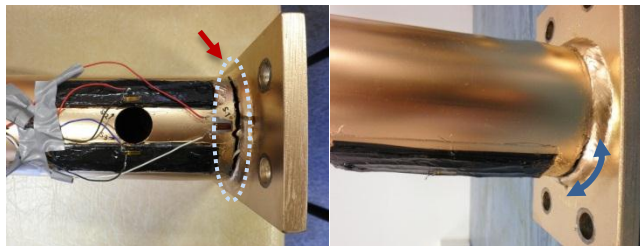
Fatigue failure at the base: top view (left), side view (right).
